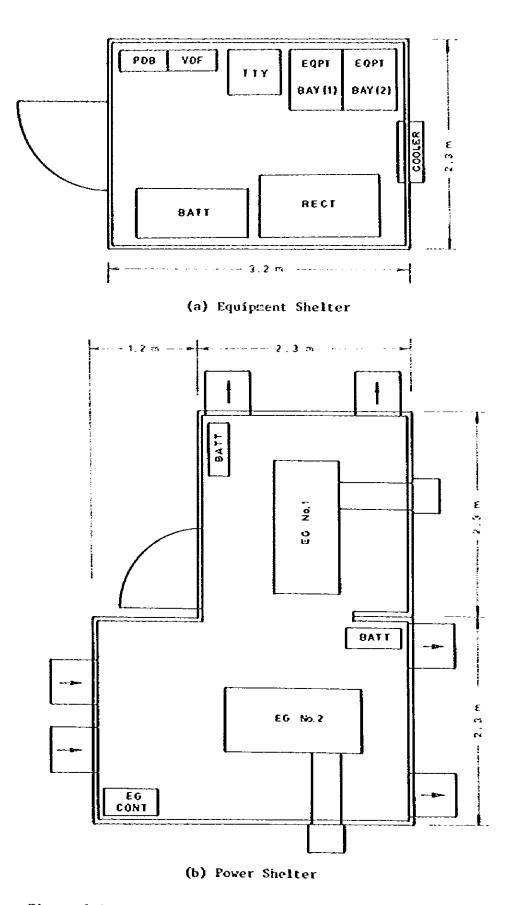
Typical Equipment Floor Layout for Rural Earth Station
